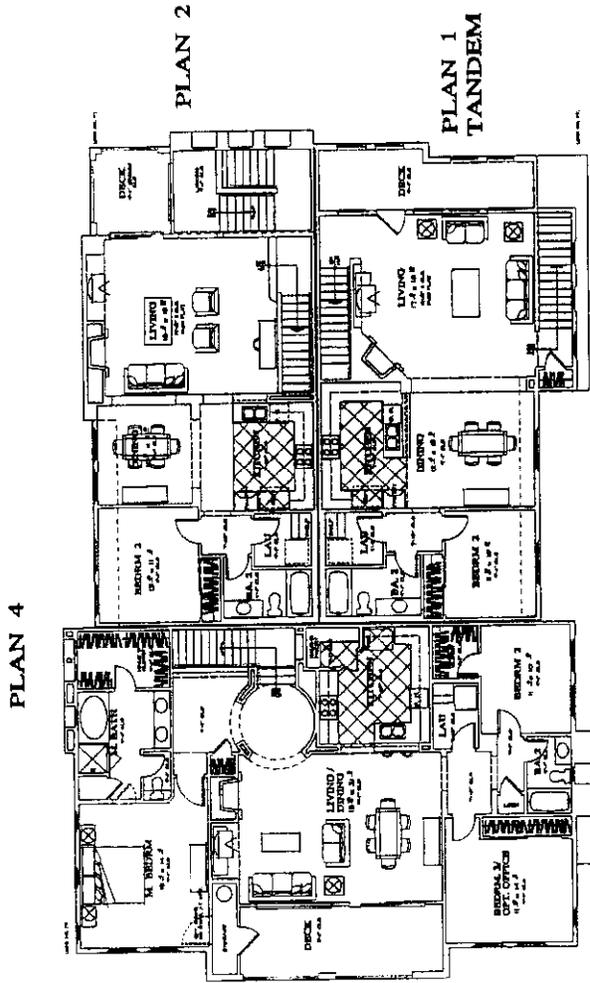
L – Arborelle – Building A - Floor Plans and Elevations (w/ Tandem Garage)
